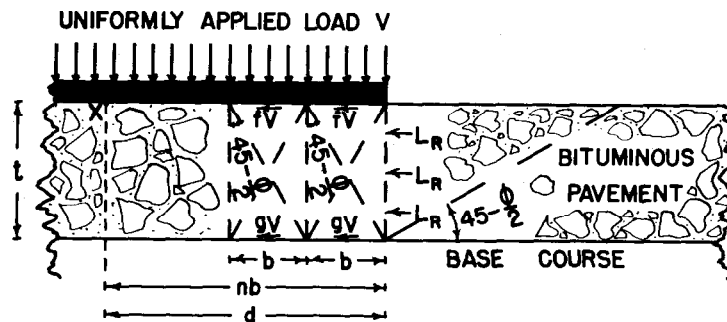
Diagram Illustrating That Friction between Tire and Pavement and between Pavement and Base is Equivalent To Additional Lateral Support For the Section of Pavement Under a Loaded Area.
